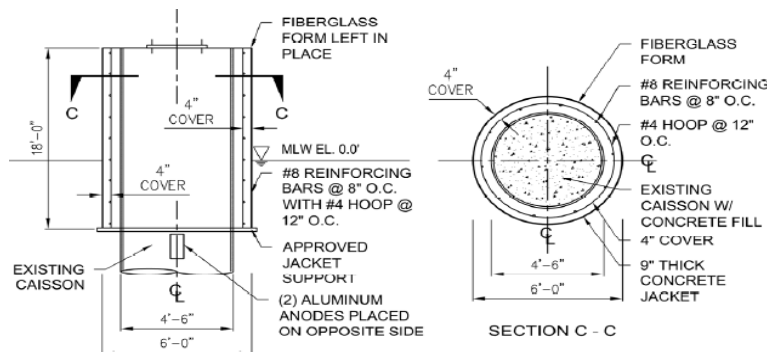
Fiberglass jacketing of existing steel pipe pile.
